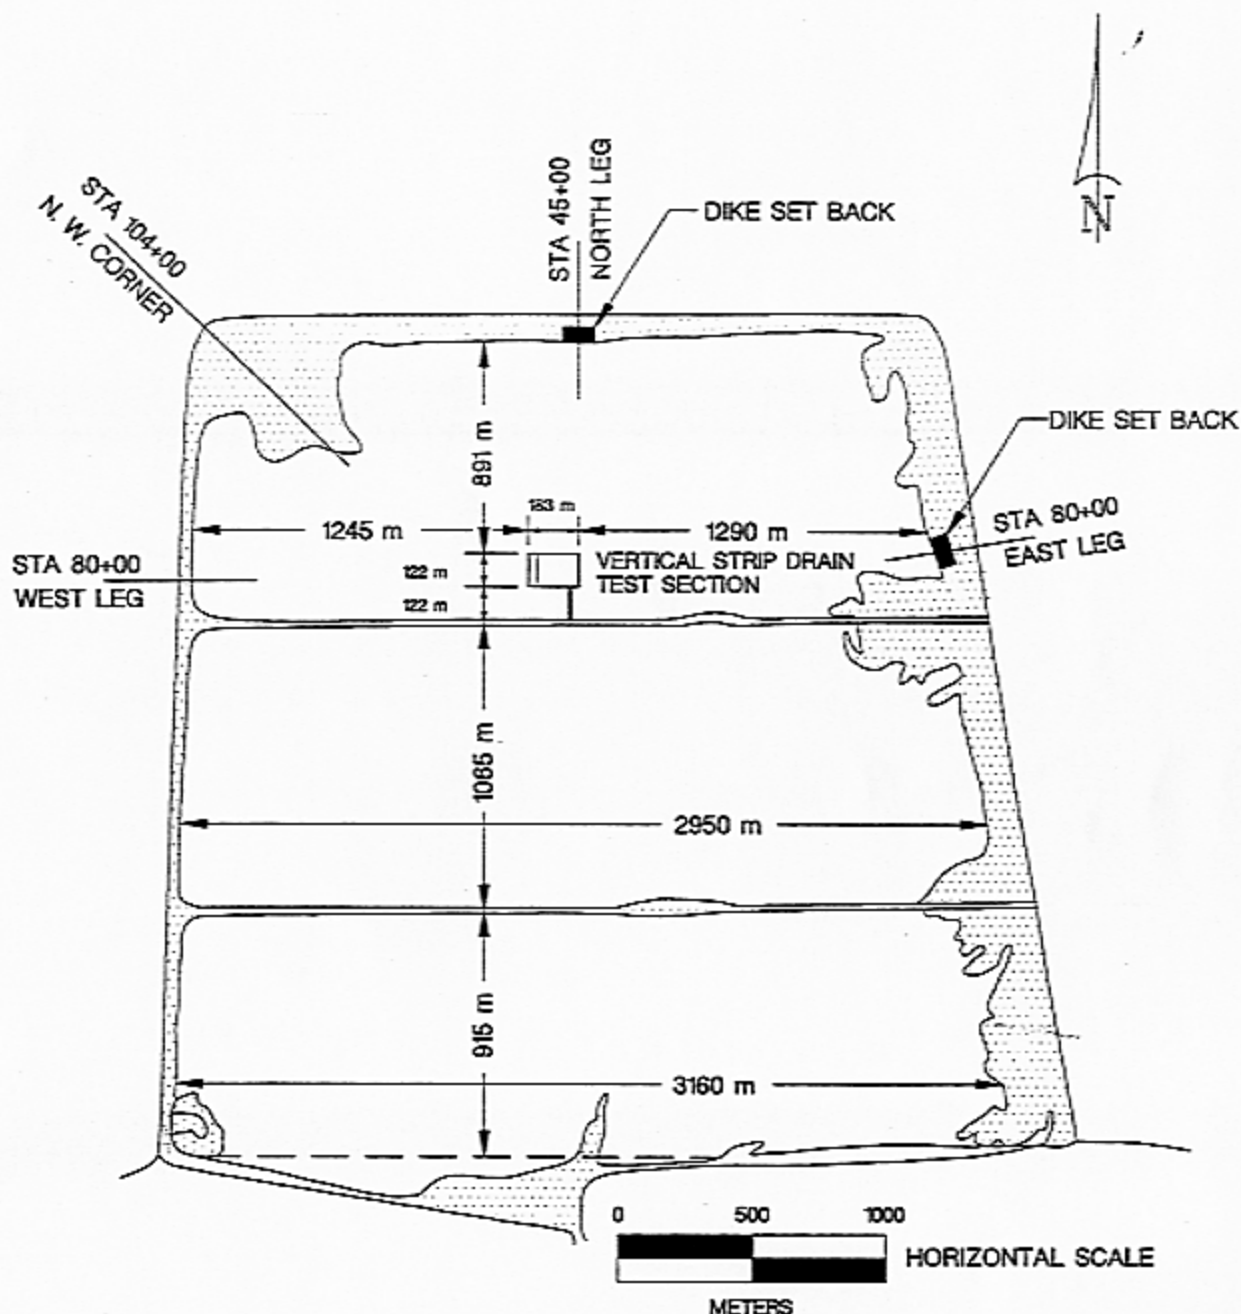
Plan View of Craney Island and Location of Vertical Strip Drain Test Section
